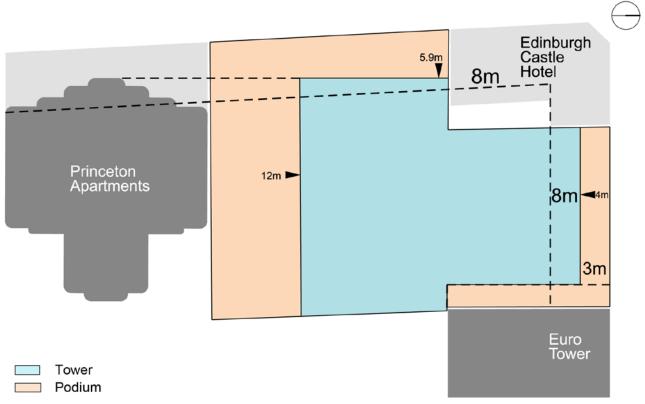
Indicative above-podium building envelope plan of Envelope Option 3
